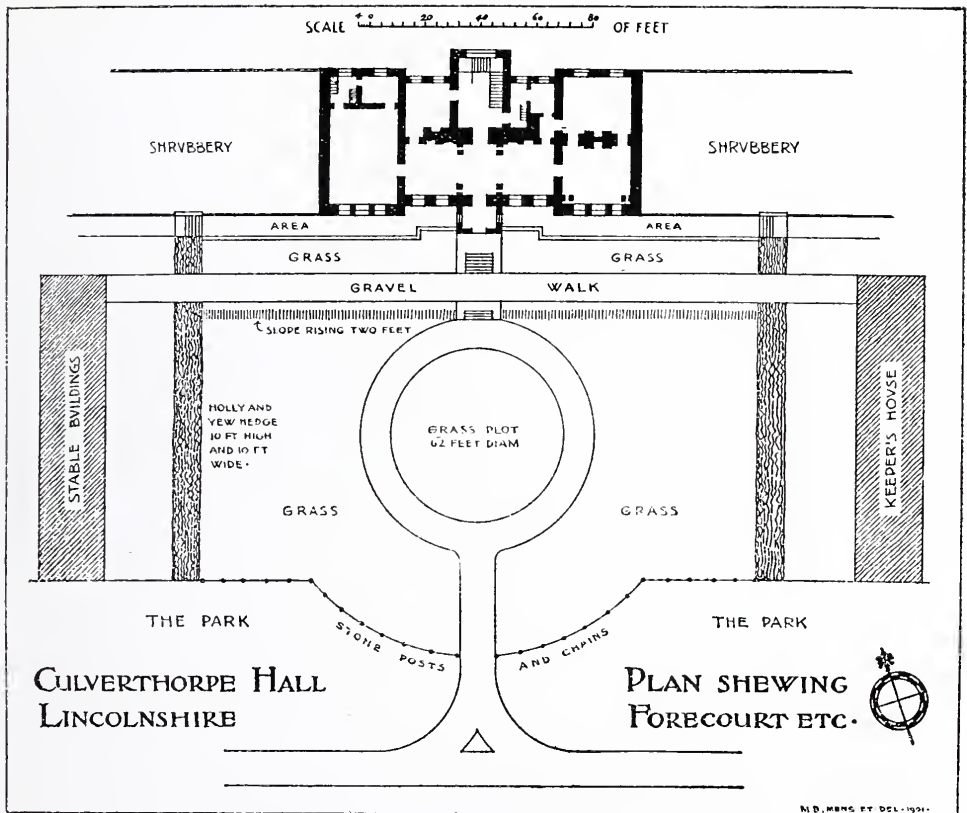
PLAN, CULVERTHORPE HALL. (See Fig. 1.)
